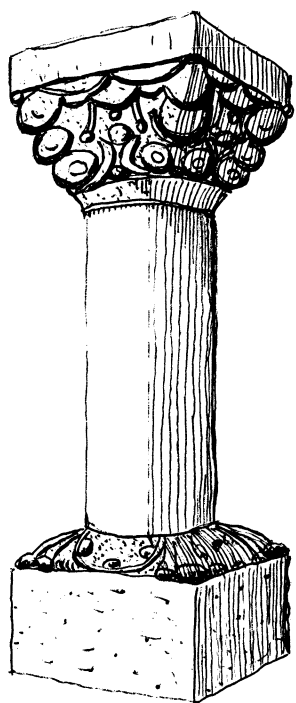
Detail, support column, main entrance, First Congregational Church (13).
